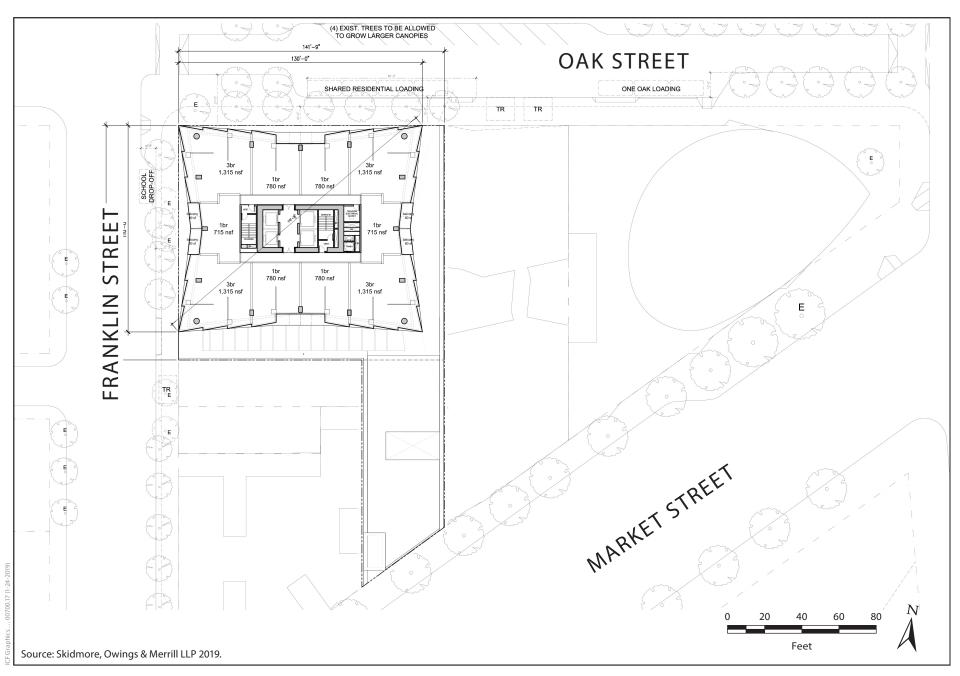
98 Franklin Street Project – Proposed Upper Tower Floor Plan
